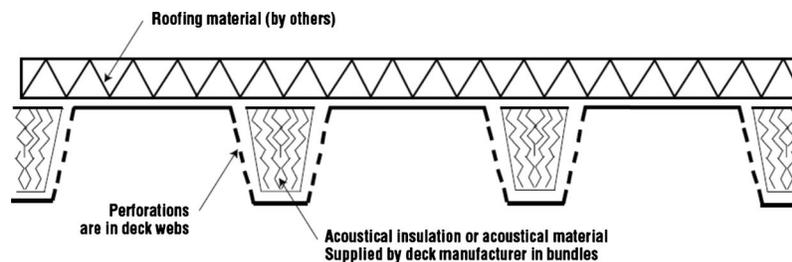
A cross-sectional diagram of the perforated steel acoustic deck used for constructing roofs and ceilings.
